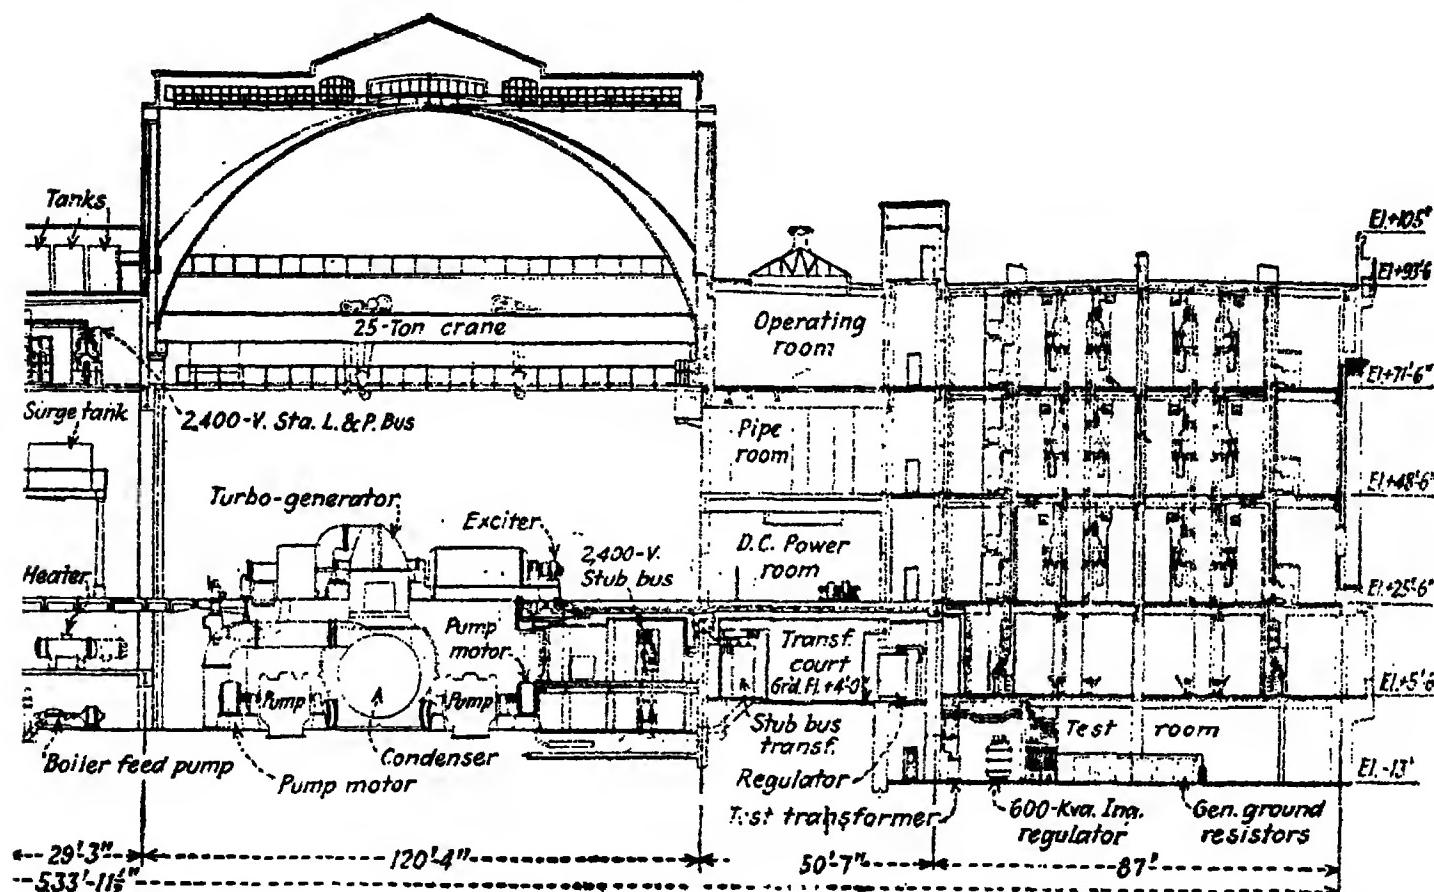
Cross-section of the turbine room and switch house of the 600,000-kw. Richmond station of the Philadelphia Electric Company.
